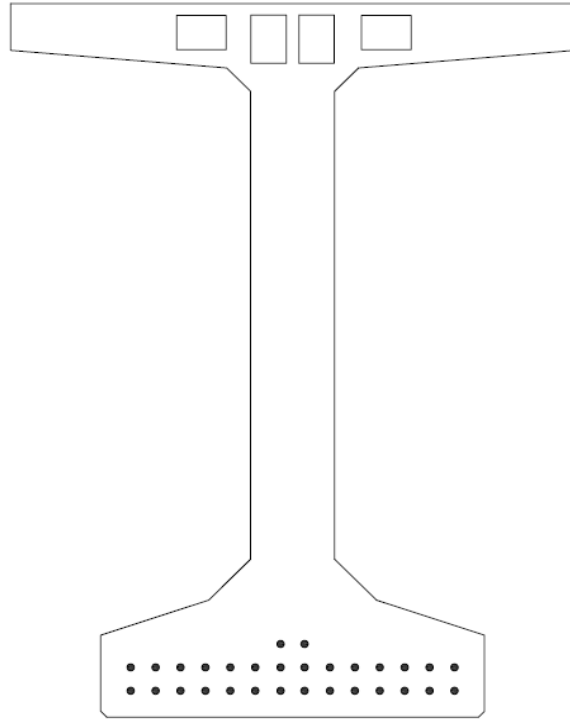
Sketch showing the arrangement of Type S6 monostrand anchorages in a PCBT girder having no draped strands.
